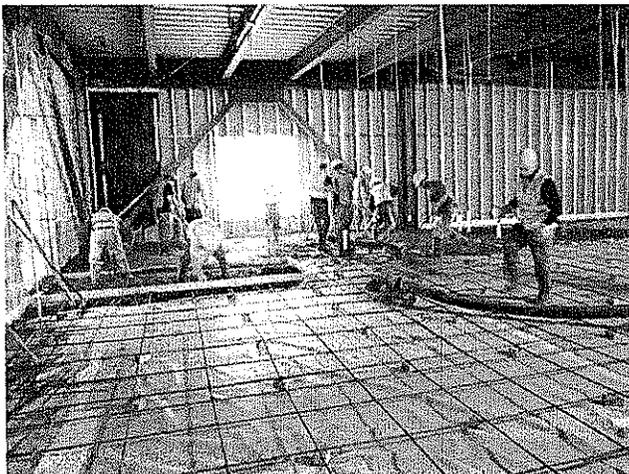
View north on the 1st floor of segment C, morning, February 18, 2011.
